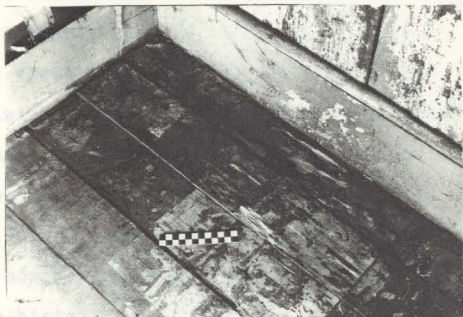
Deteriorated area in southwest corner of parlor floor. (scale = 6")
